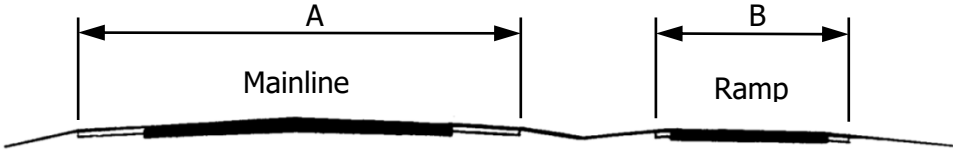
Approach roadway cross-section view for a mainline and a ramp that are carried across one bridge.
